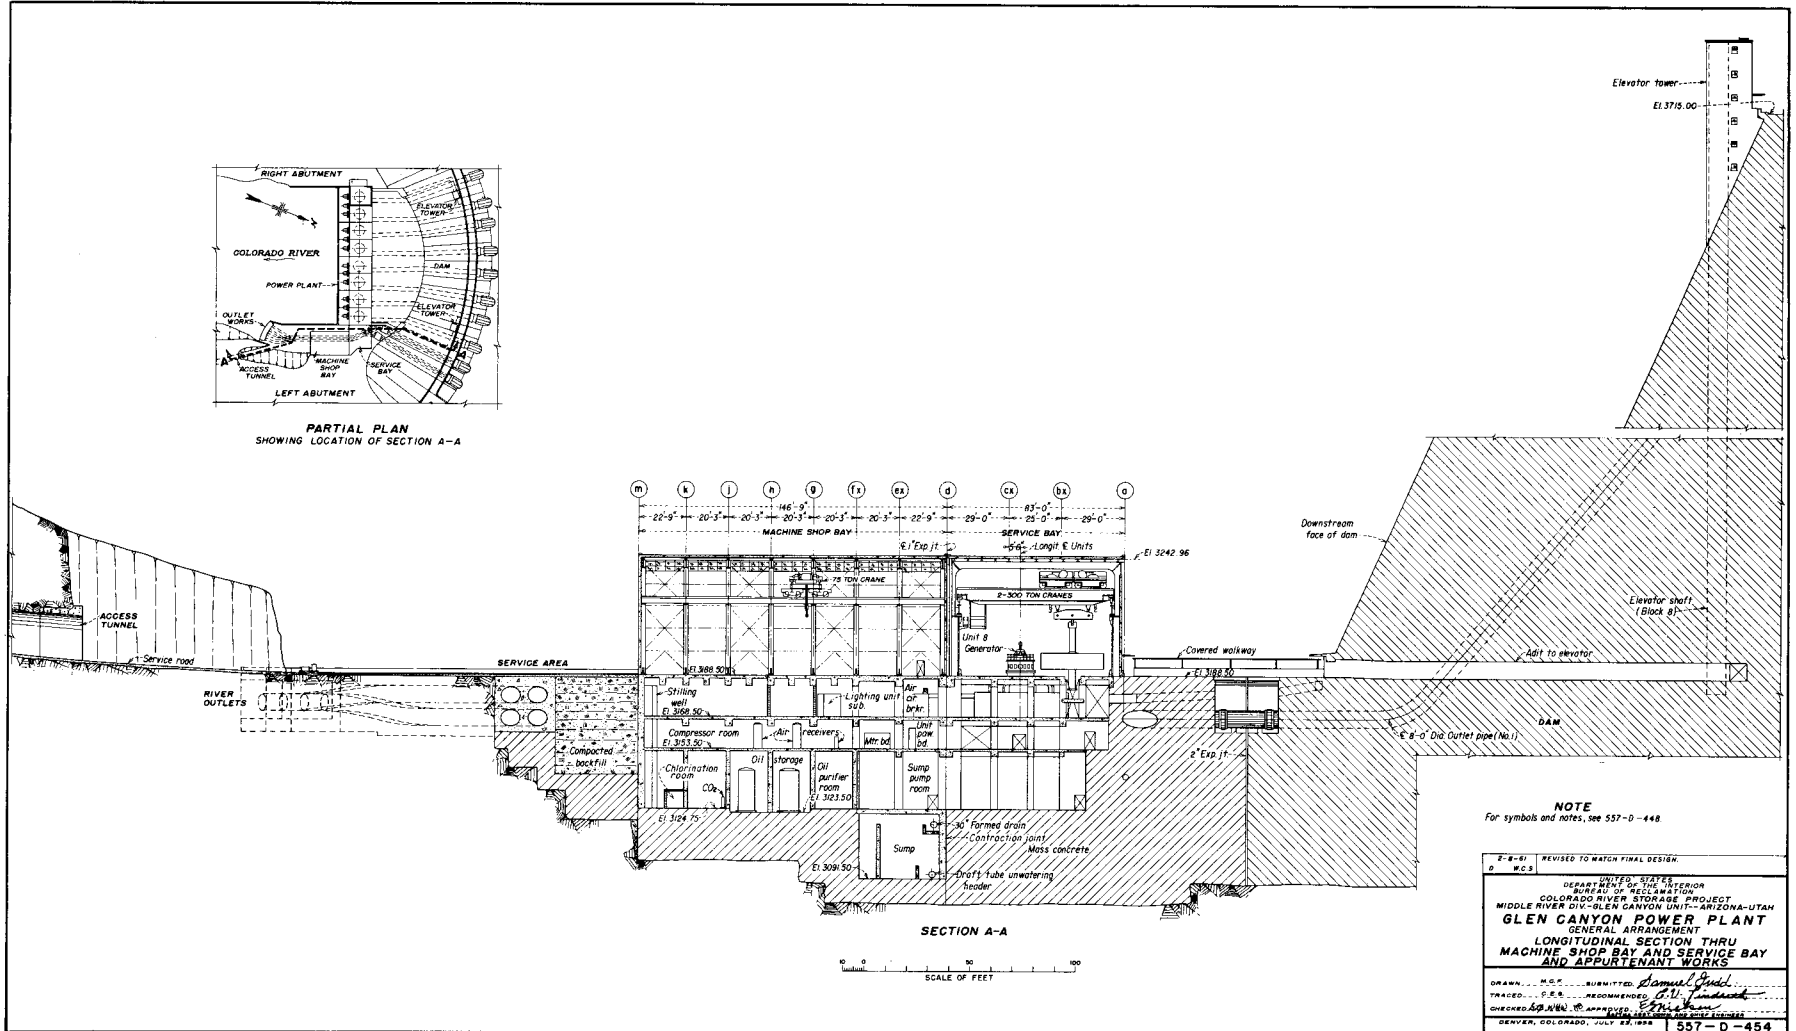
Powerplant general arrangement—Longitudinal section through machine shop bay and service bay and appurtenant works.
